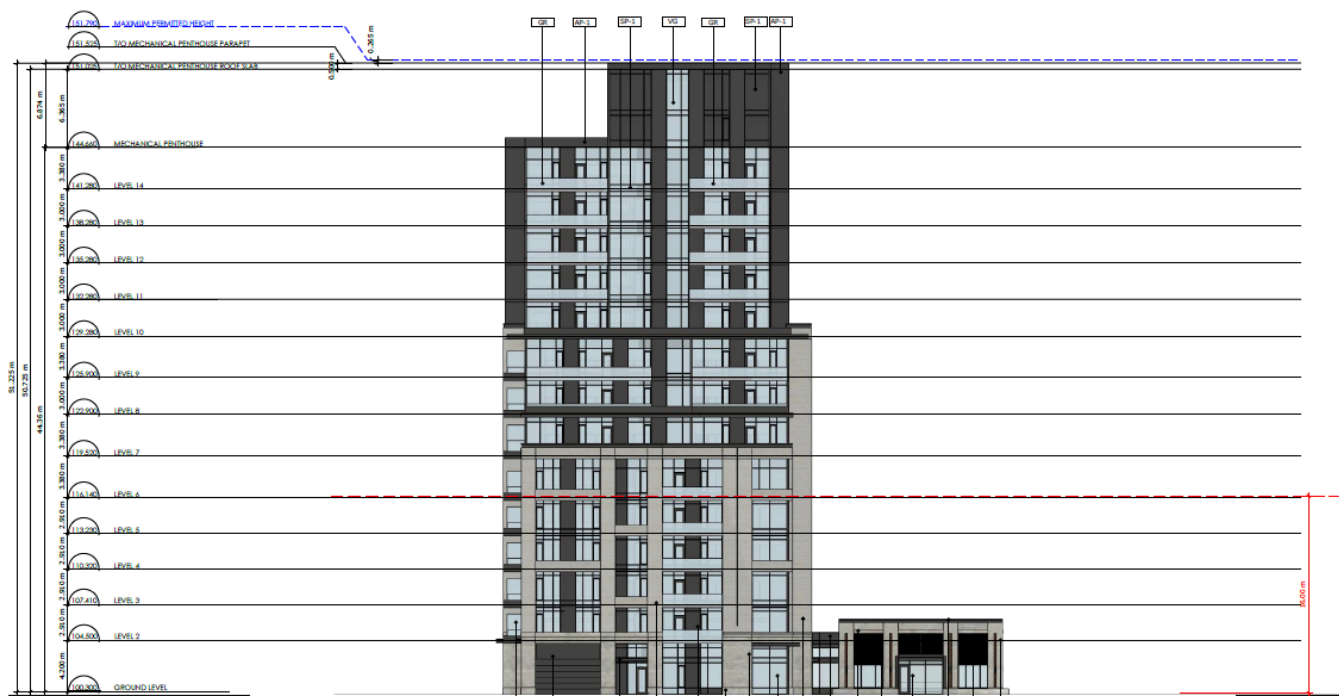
East Elevation (south building) - looking from the east property line (North Bowesville Road), prepared by Hobin Architecture
